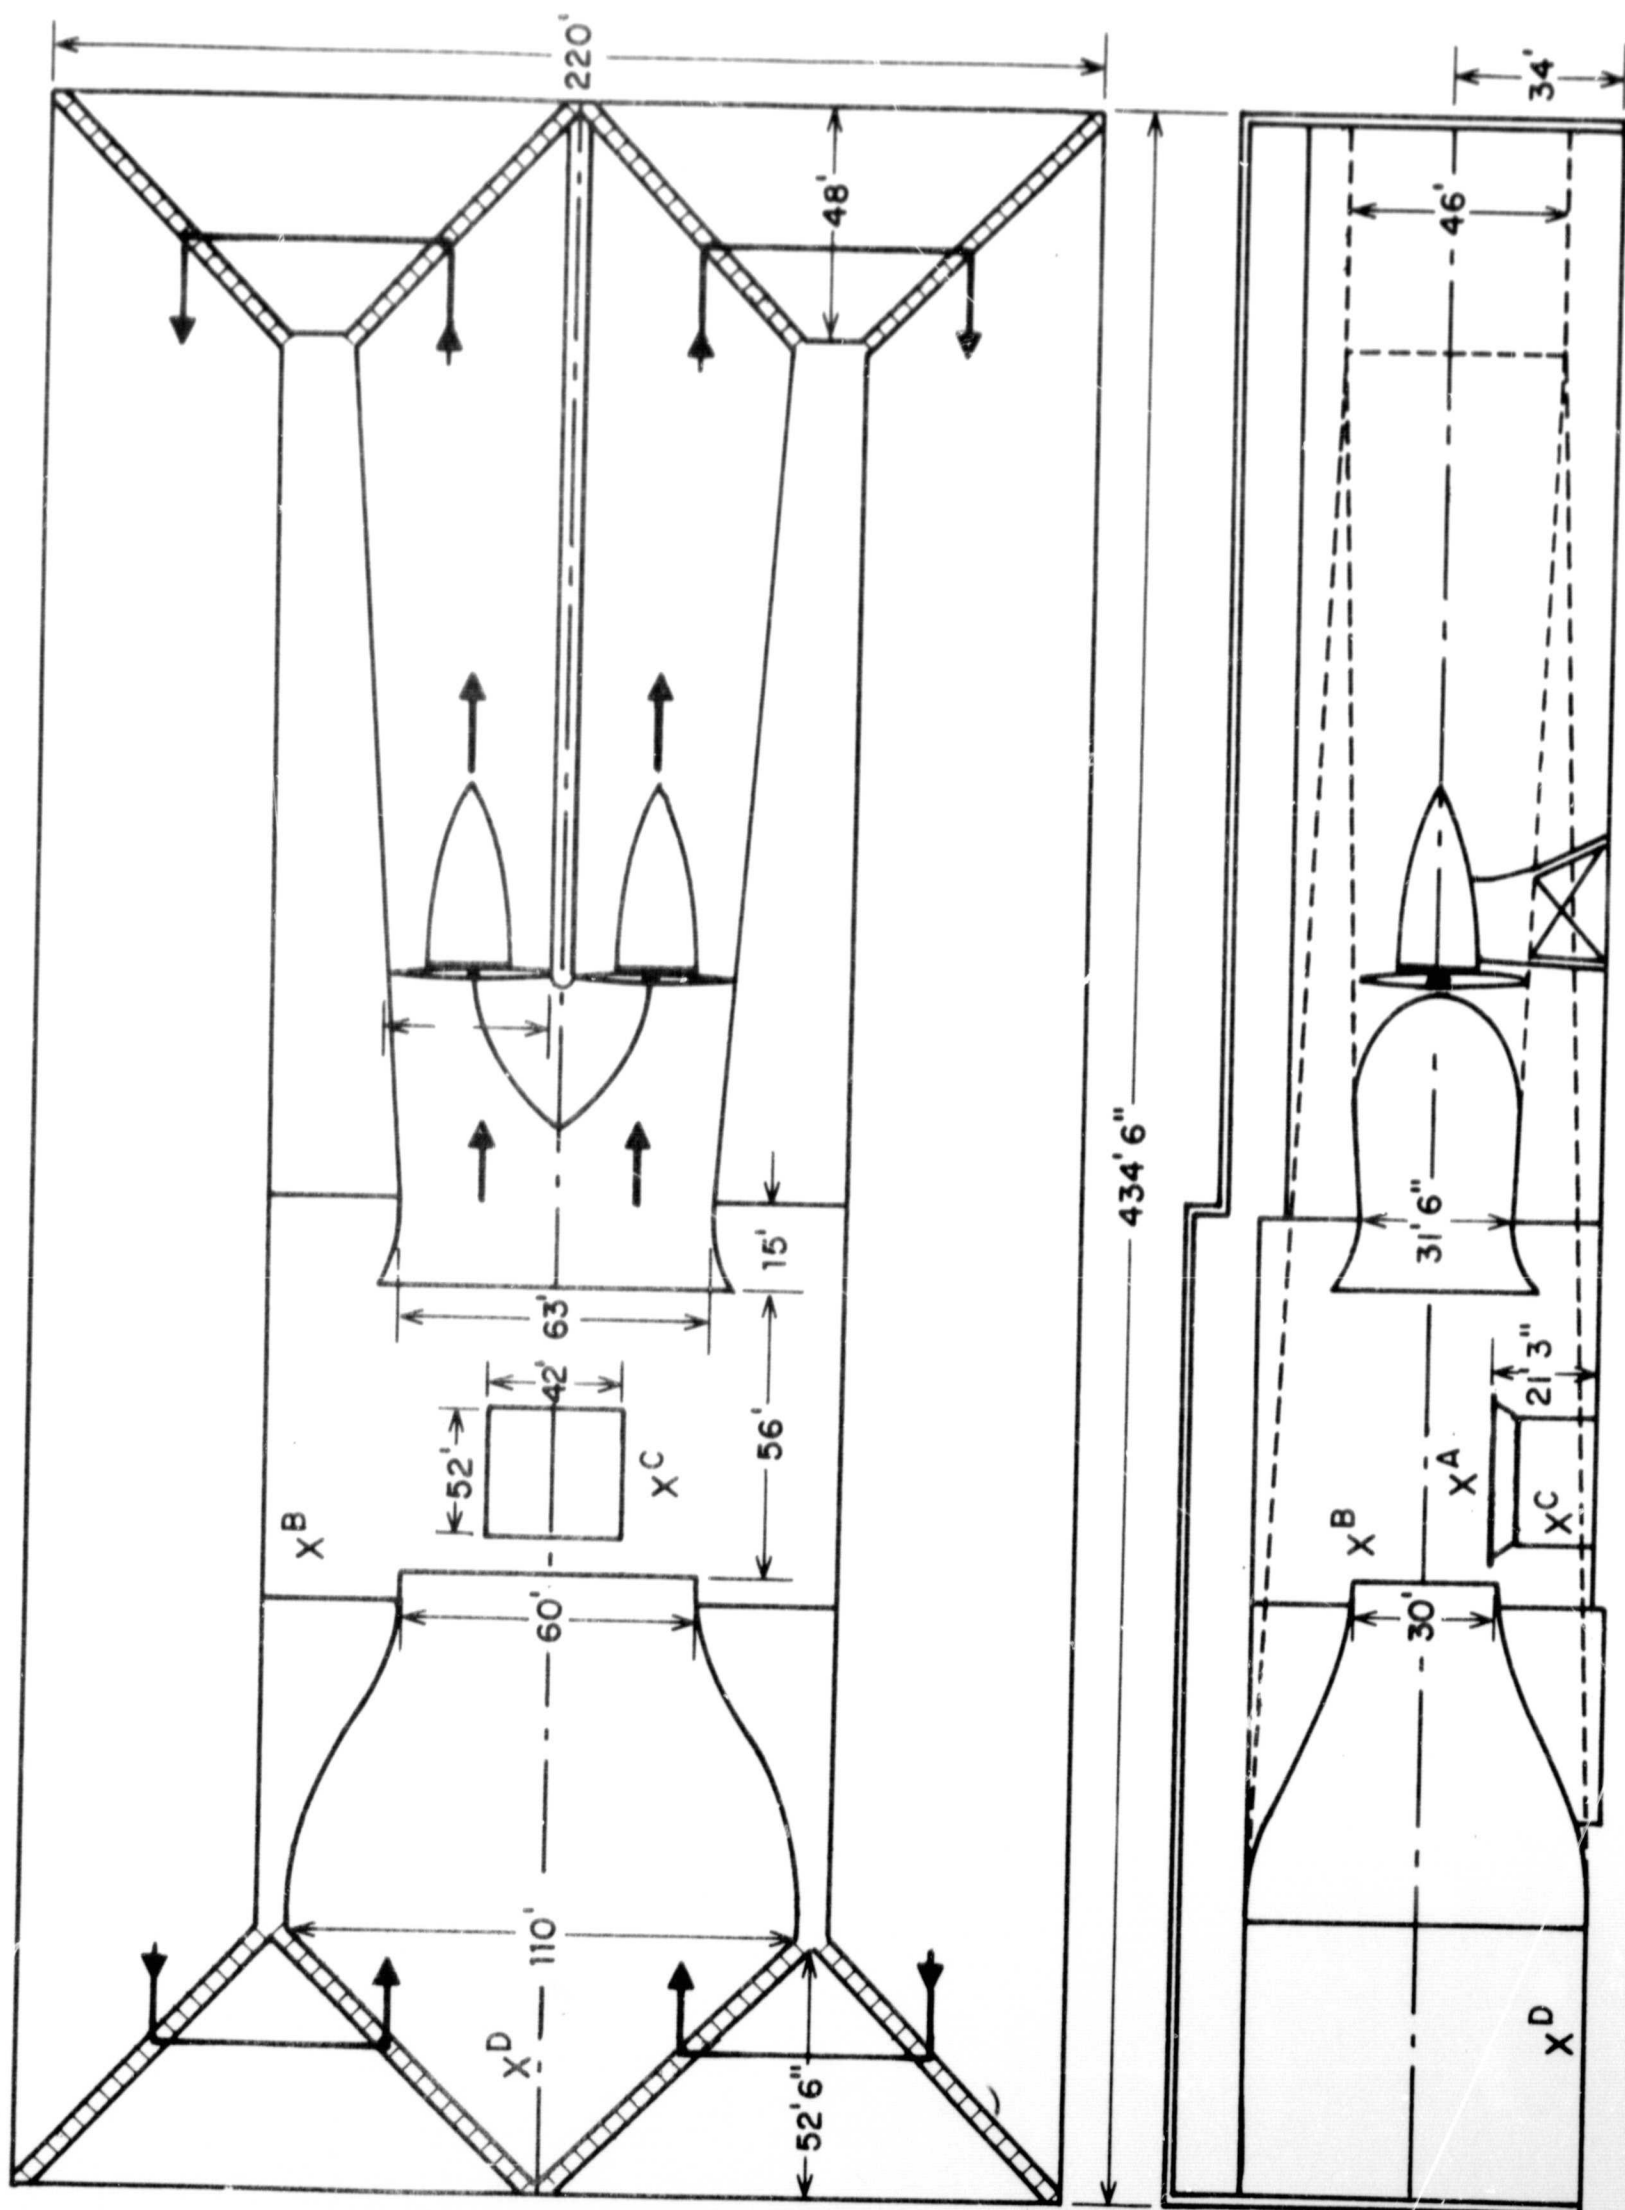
PLAN AND CROSS-SECTION OF THE TUNNEL
